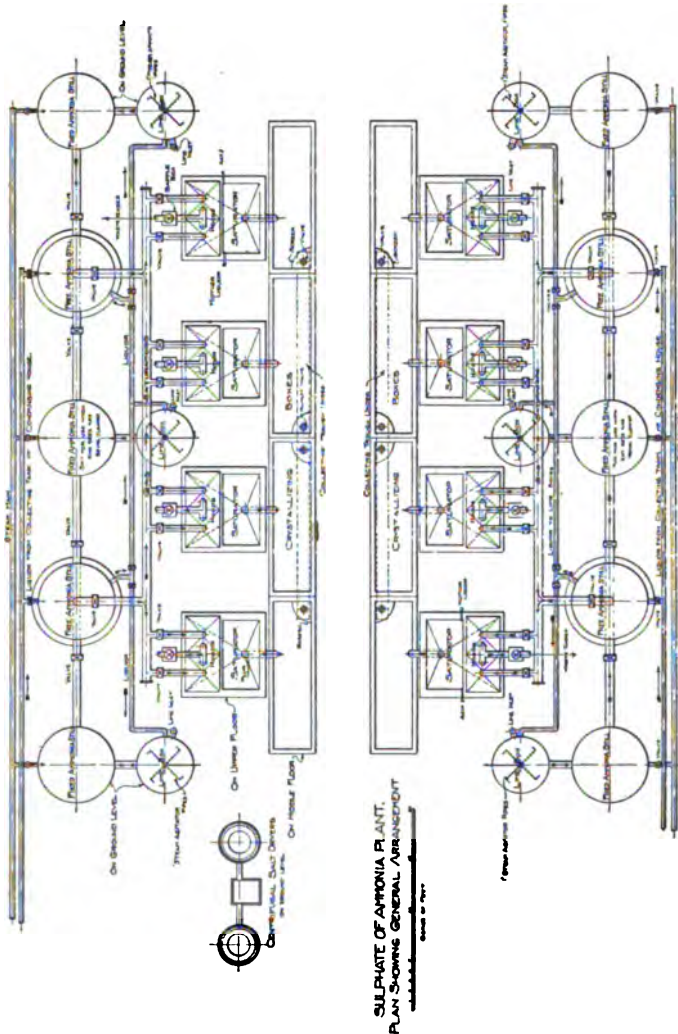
Sulphate of ammonia plant. Plan showing general arrangement.
